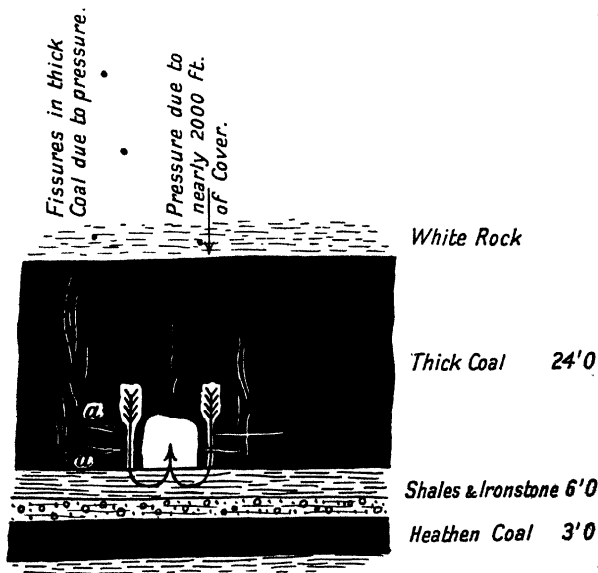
DIAGRAM ILLUSTRATING PRESSURE ON FLOOR BY ROADS DRIVEN IN THICK COAL. Arrows denote direction of pressure on bottom or floor. *a, a* denote side or horizontal fissures connecting with main or vertical fissures.
